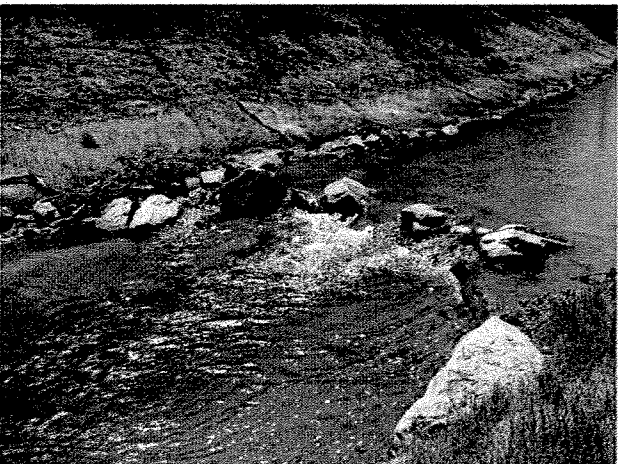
Looking downstream at log vane installed at MS Station 49+02, log toe protection, and root wad. (4/7/04)
